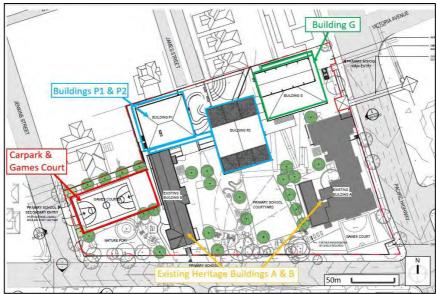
| CPS proposed site plan (Base source: RtS 2020)
